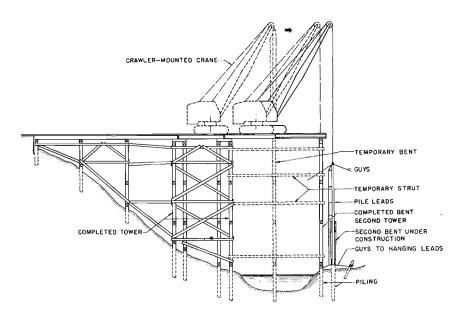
Crawler-mounted crane operating over falsework to drive piling and erect timber tower for long span.
